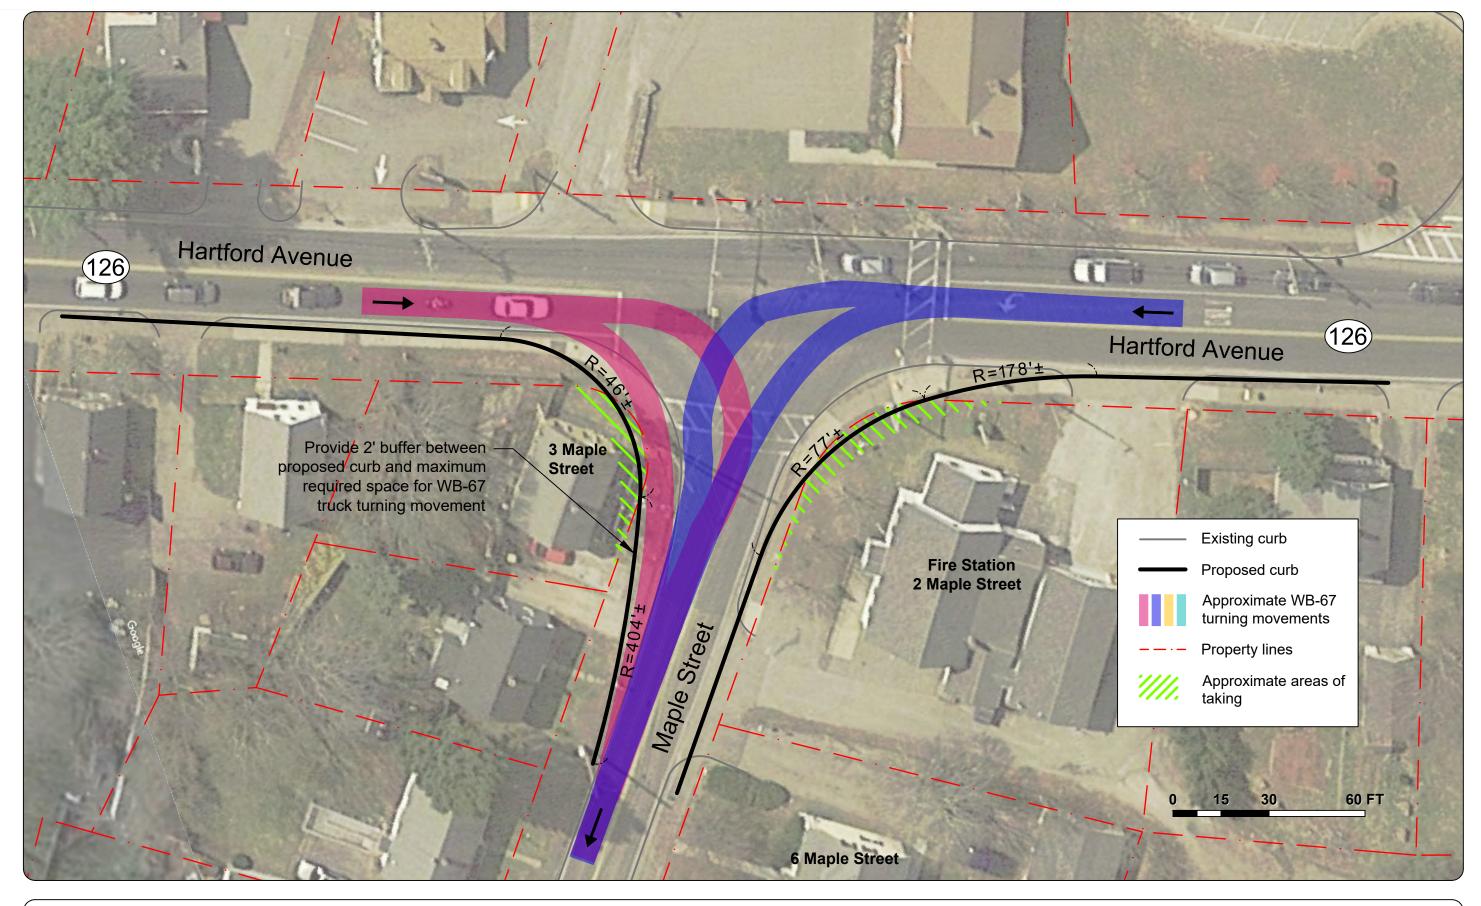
Alternative 1: Truck Paths Turning Onto Maple Street Redesign of Hartford Avenue and Maple Street Intersection
